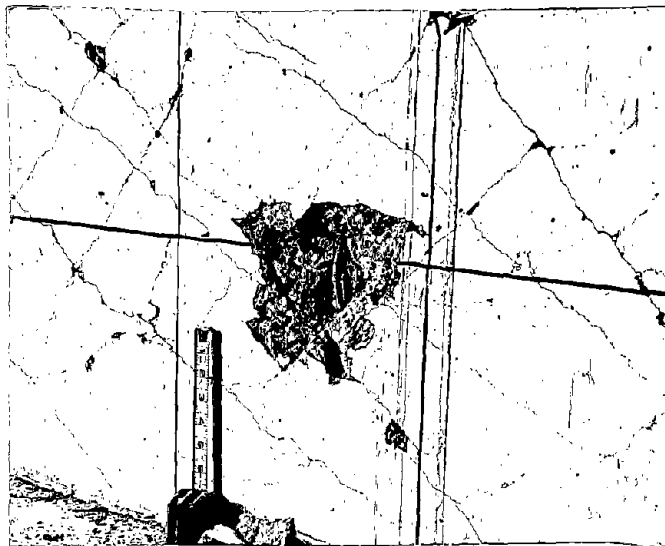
Spalling in the Web of Specimen B9R Caused by Buckling of Vertical Reinforcement
